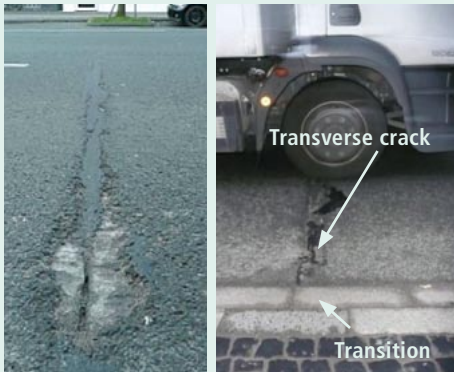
The „edge pressure“ (KP) load case with a transverse crack in the road surface, transition between various carriageway structures
